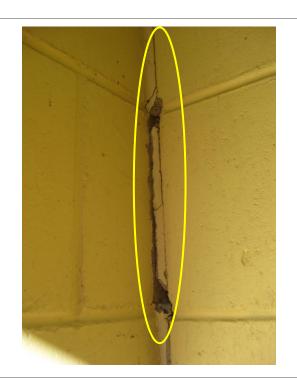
Cracking along Mortar Joint in SE | Photo 18: Close up of Photo 17 Corner of Ladies
